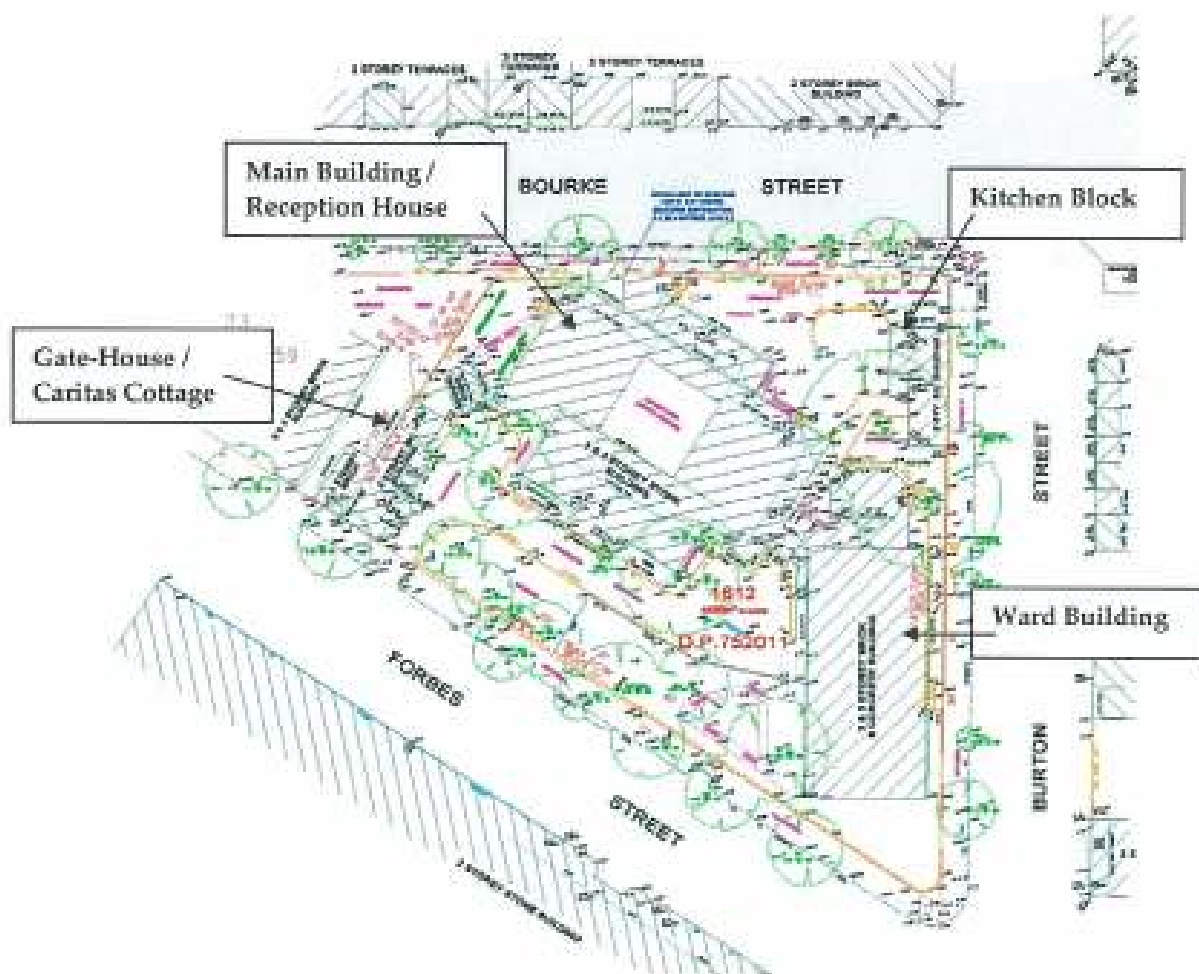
Current Site Survey Plan showing extant Buildings (Extract from Plan No. 72150/3 prepared by Rygate & Company Pty Ltd, 12-7-06)
